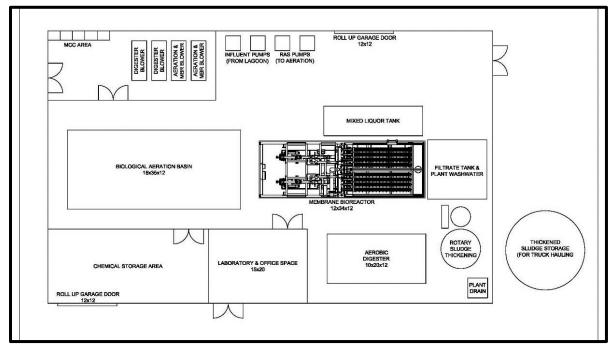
Conceptual Building Layout for Alternative 5 - MBR Treatment Plant
